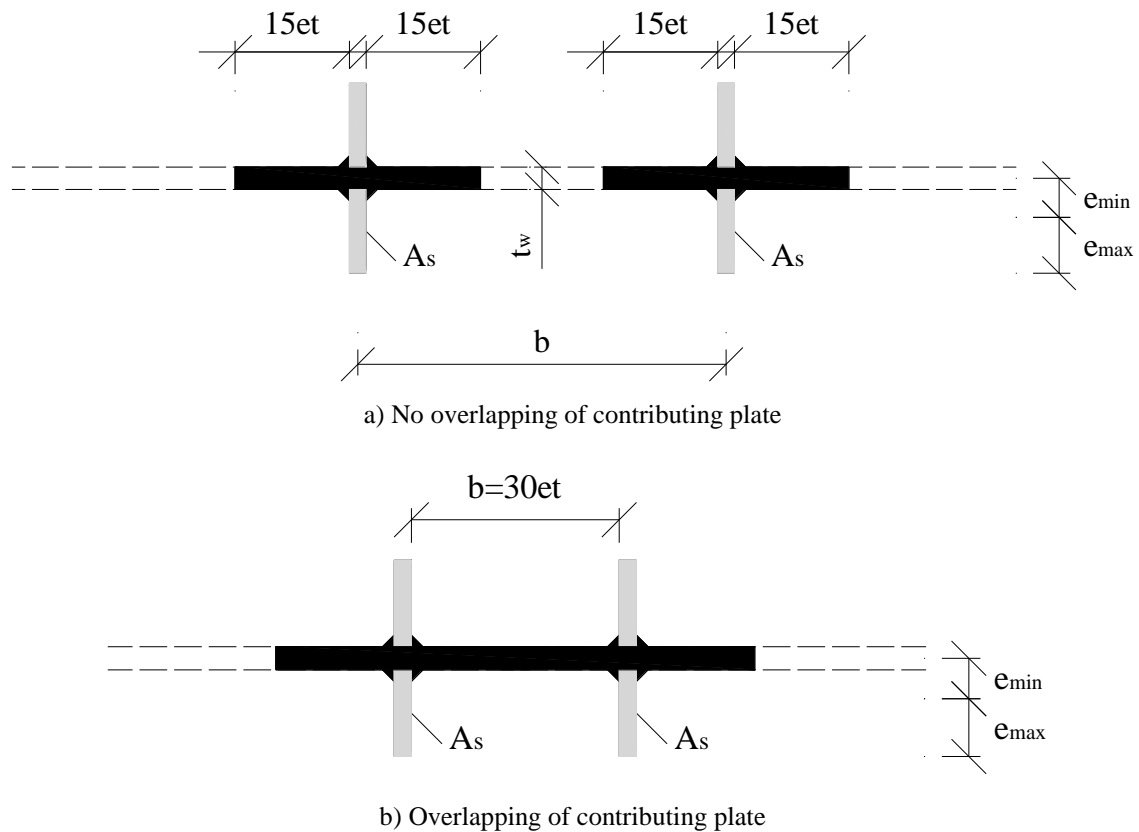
Effective cross-section of stiffeners (Beg et al., 2010)
